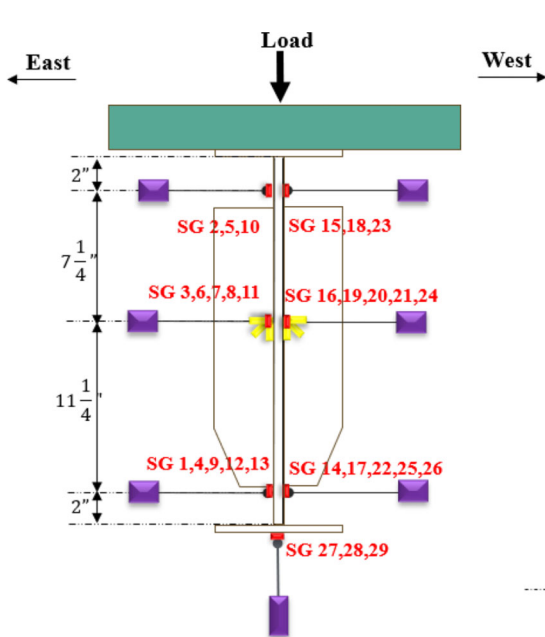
Strain gauge layout (front elevation): Specimen 7.
